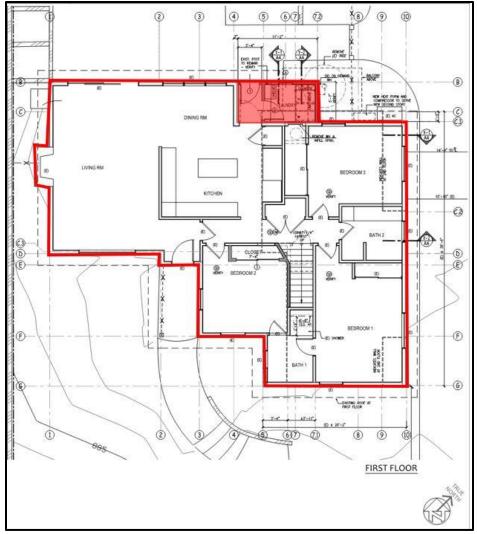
1st story floorplan of the proposed development with additions shown in red
